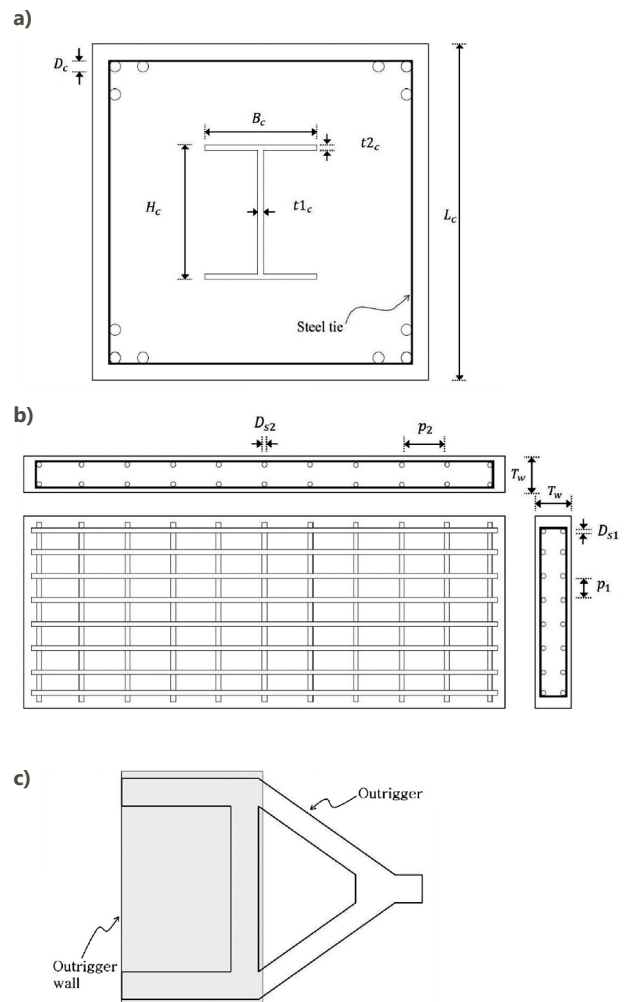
Major structural elements of mega-structure system for a high-rise building: a – mega-column section; b – core-wall section; c – outrigger-wall section
